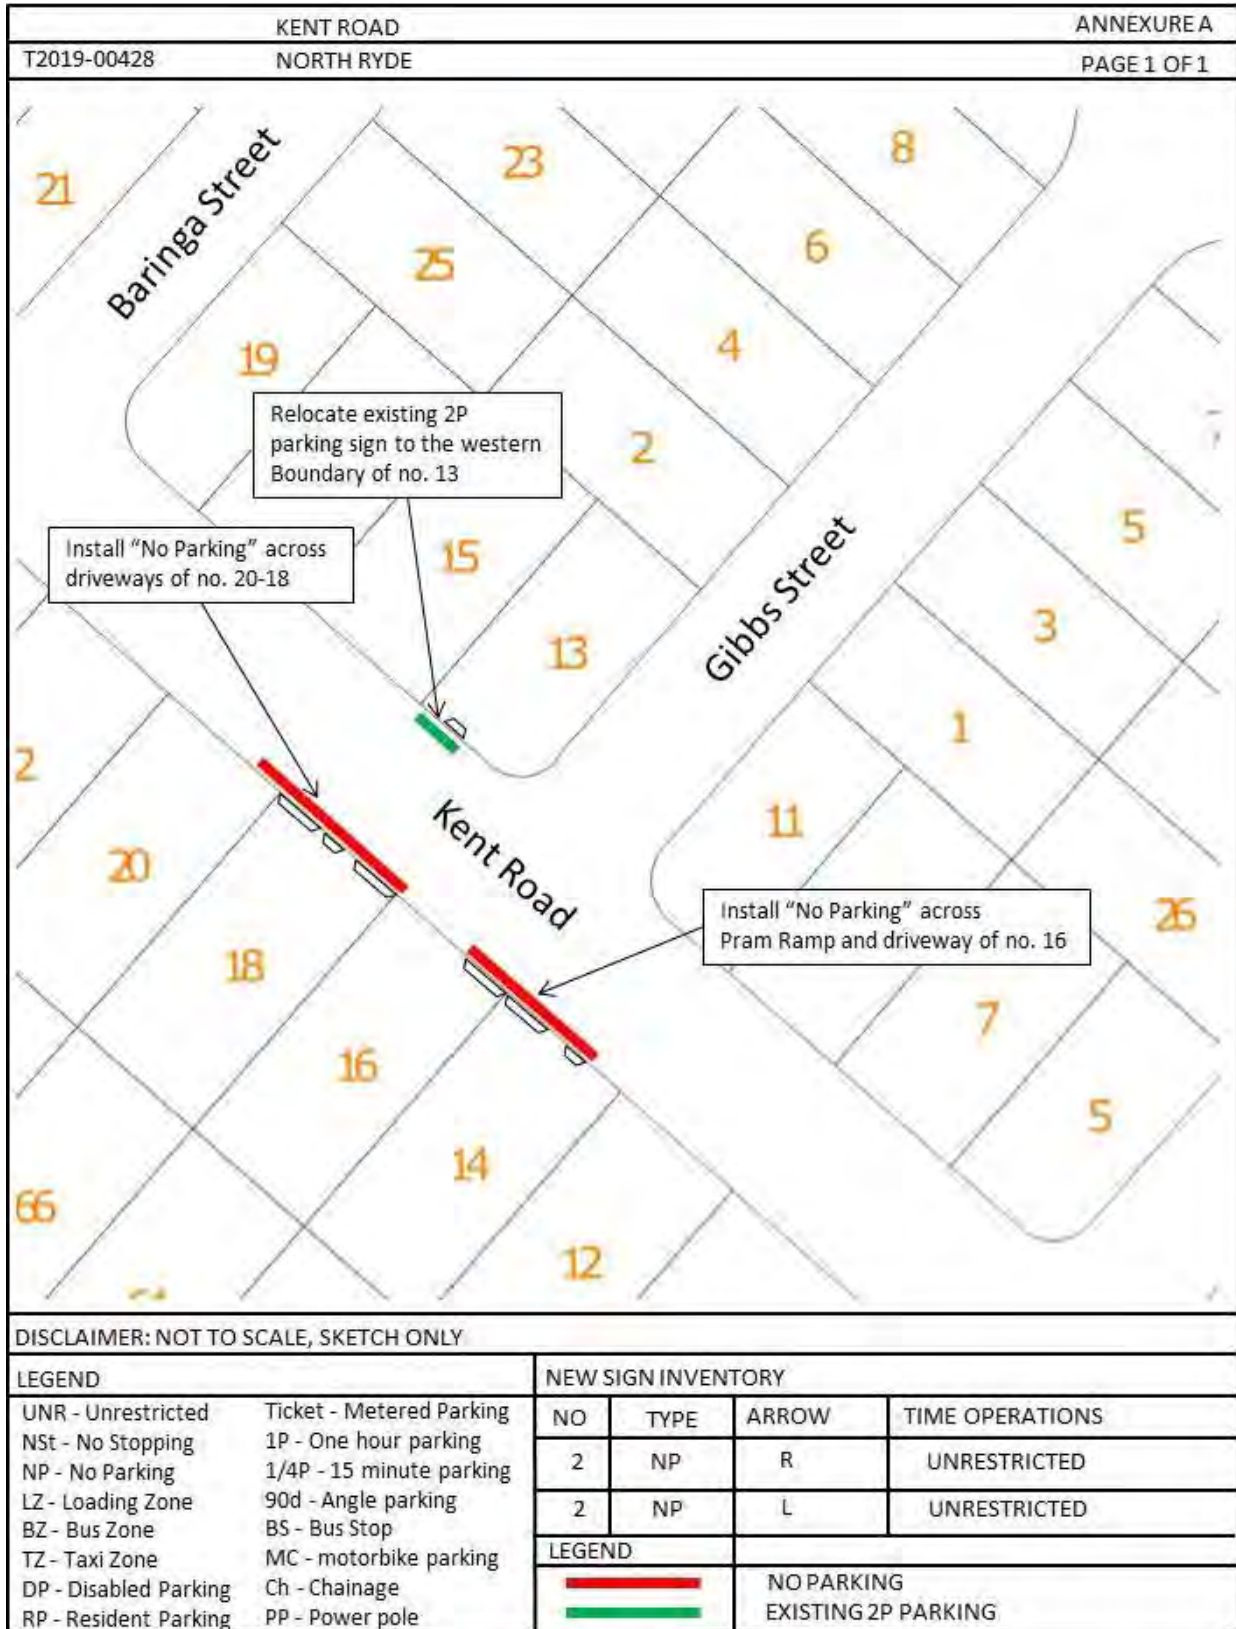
Proposed Parking Changes in Kent Road, Ryde
